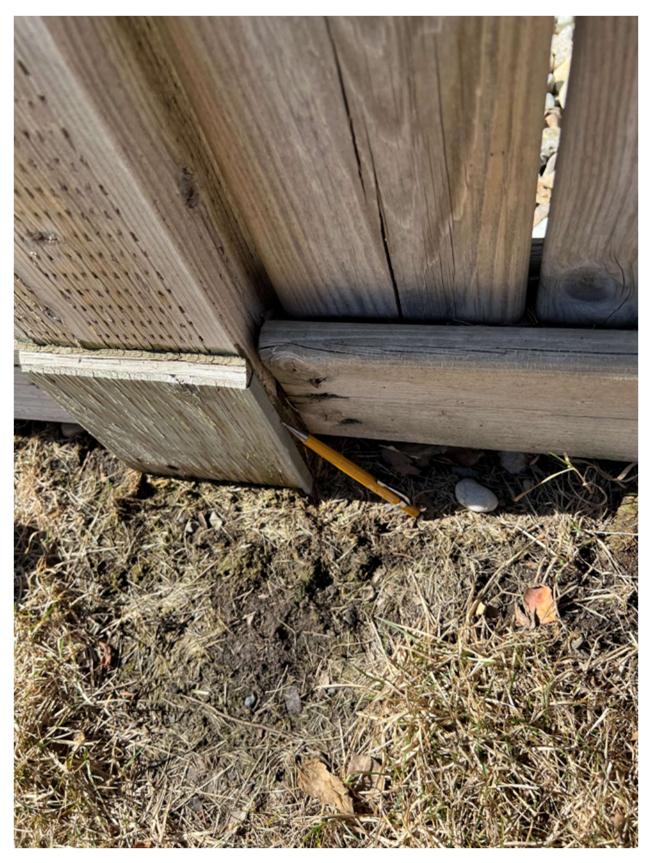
Sacrificial board with metal edge installed in 2016 saved penetrating the PWF water proofing.
